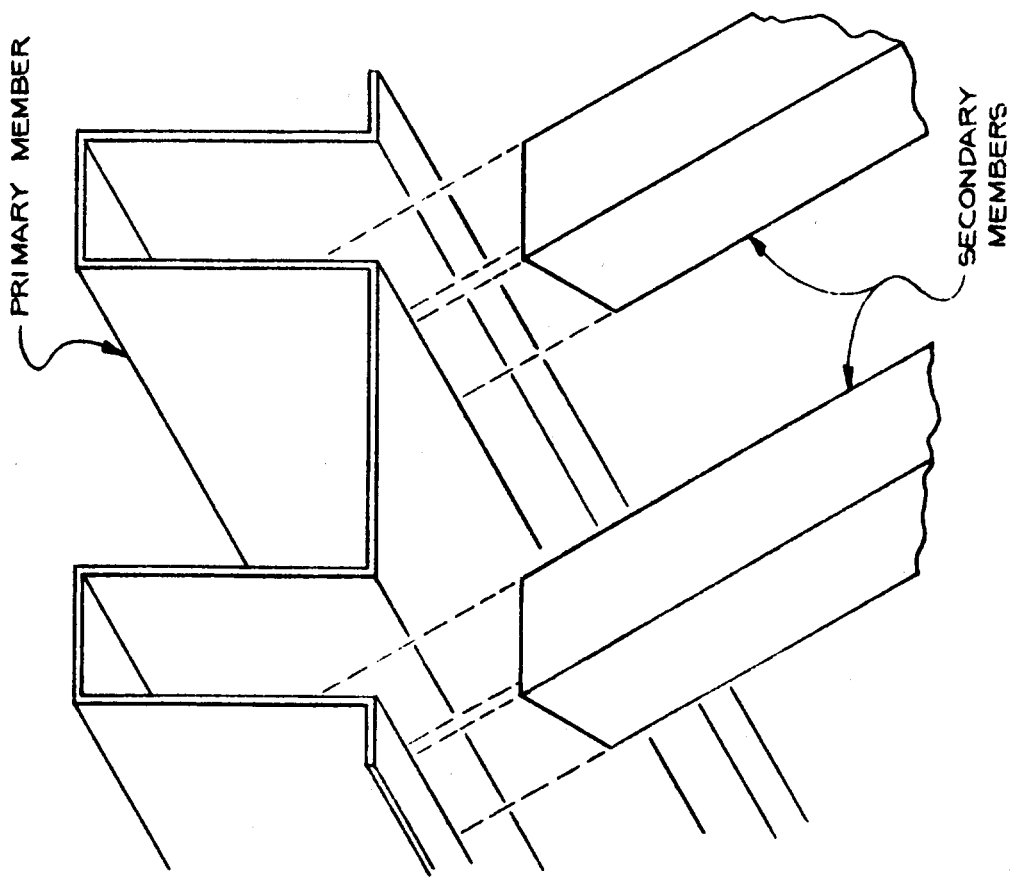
PRIMARY/SECONDARY ATTACHMENT IN TRUSS
